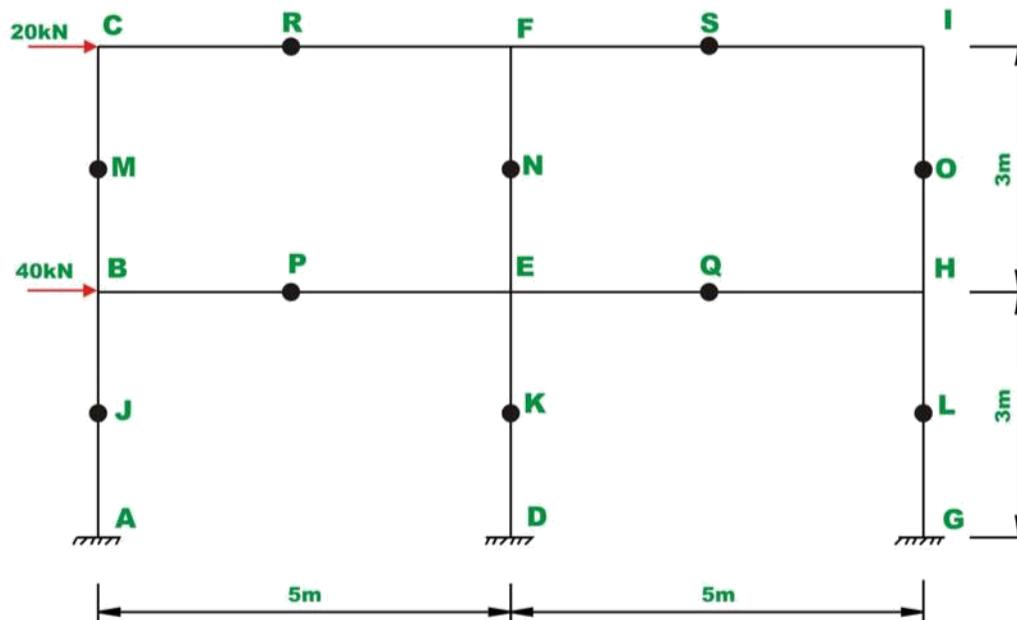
Two storey building frame subjected to lateral load of Example 9.2
